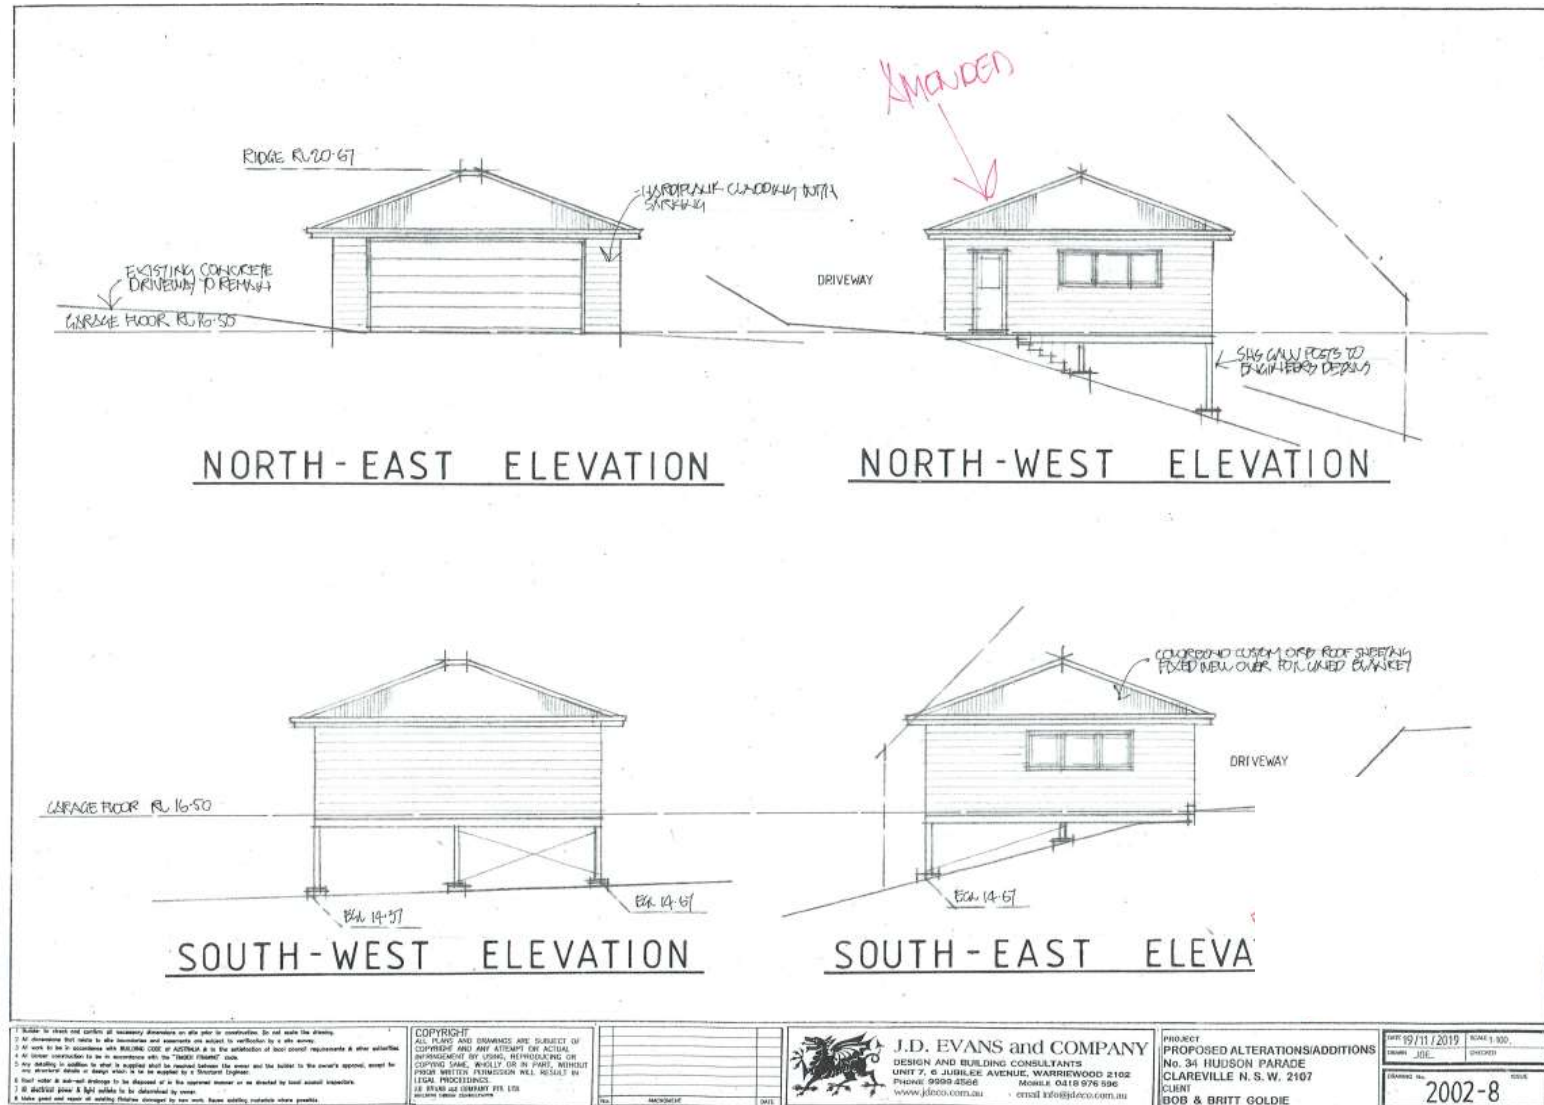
Proposed Residence/Deck-Stairs Elevations (pages 10, 11, 12), Proposed Garage/Home Office Elevations (above).
